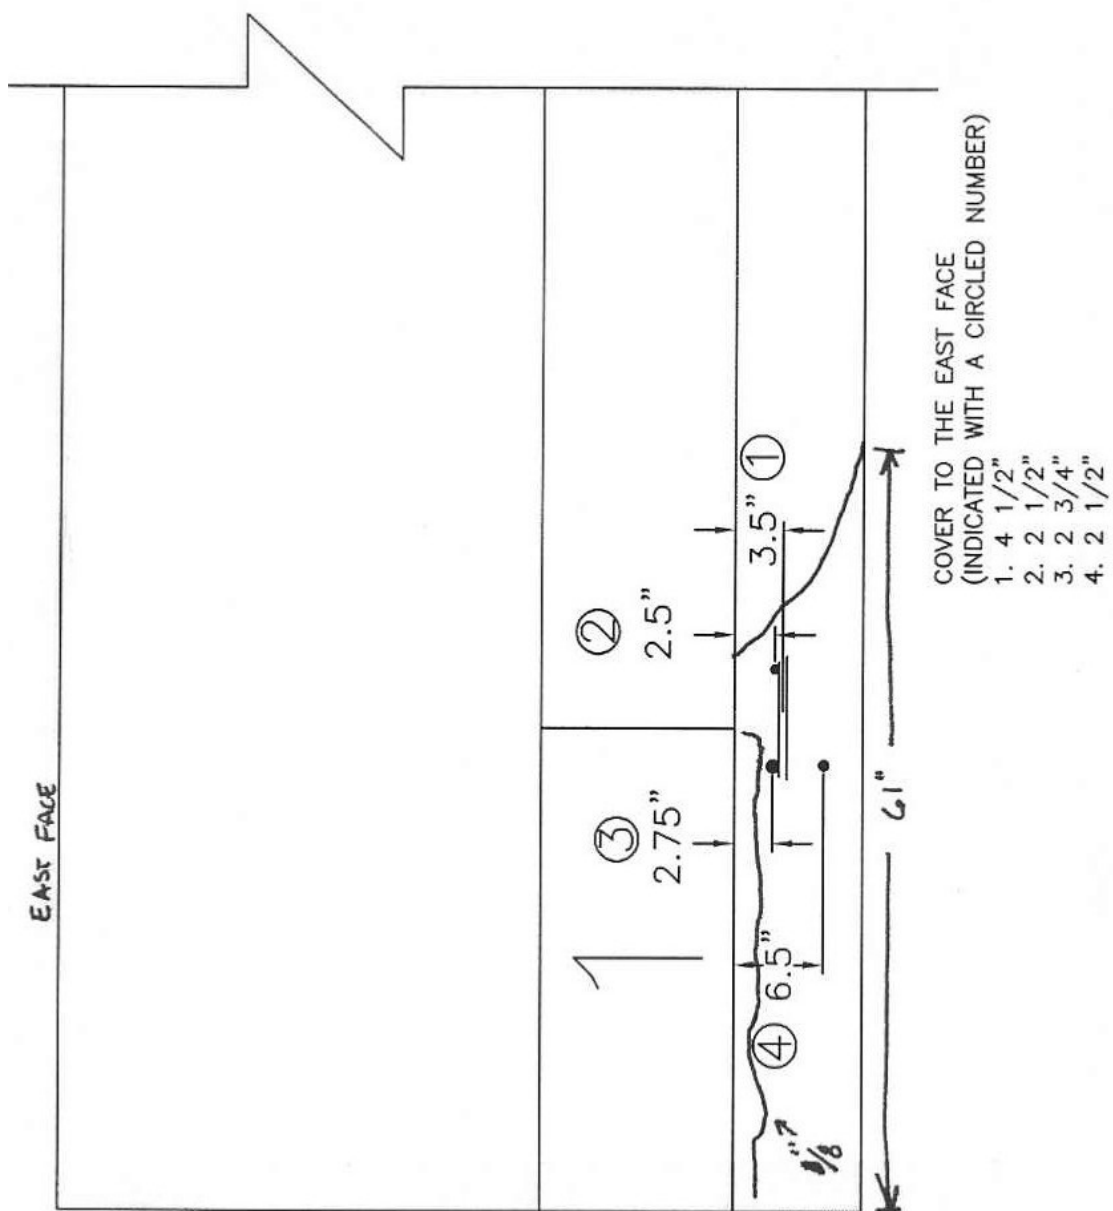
Concrete Damage – Back-side of Rail at Post No. 1, Test ACBR-1
